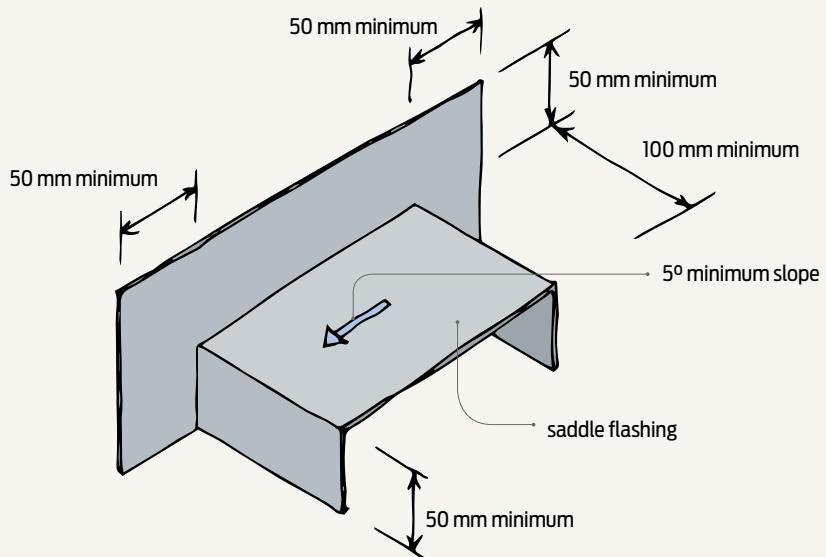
Fabricated saddle flashing to framed balcony/wall junction or at intersection between different height parapets.
